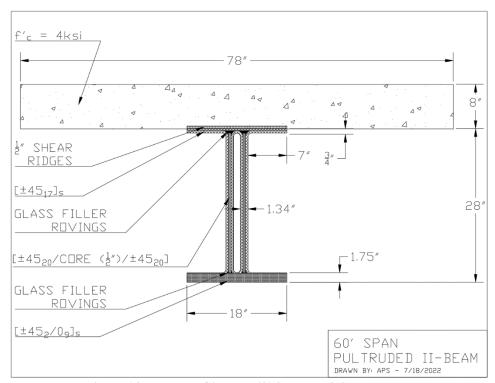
Double-I Girder – 60' Span – Minimum Depth
